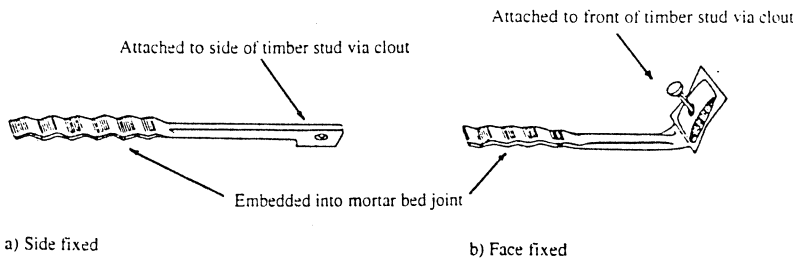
Typical Wall Ties for Timber Back-up [ADCM 1993]
